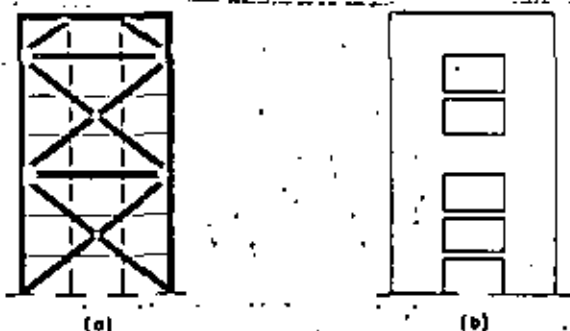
Efficient use of stiffening elements, (a) cross braces, (b) shear walls and spandrel beams
